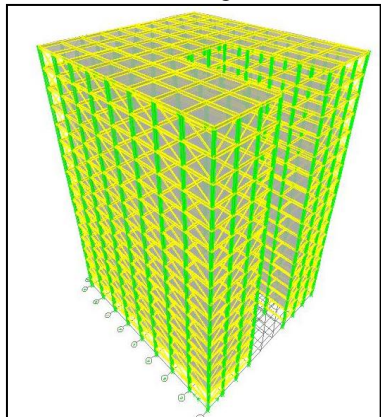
3D model of G+16 storey building with Diagonal 2 bracing
